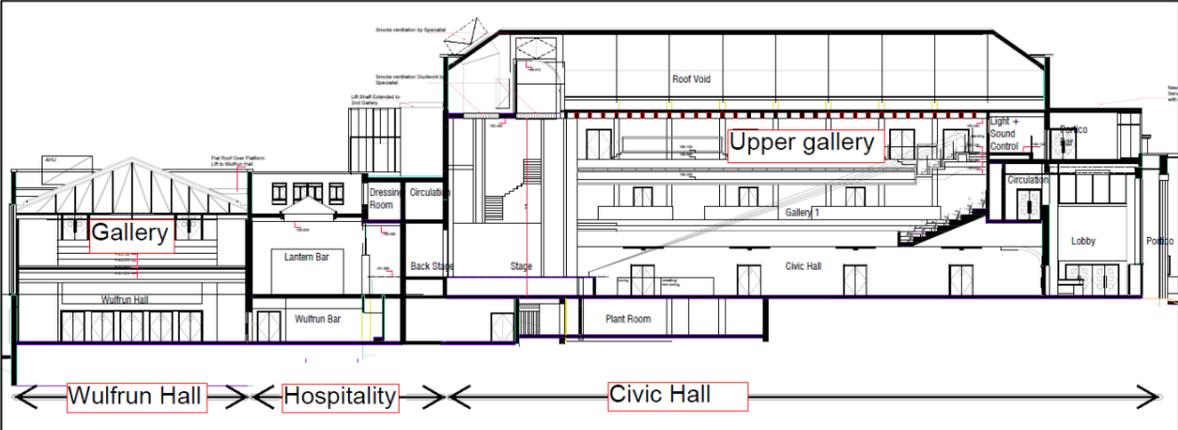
Schematic section of the Halls showing the proposed new tier at Level 3 in the Civic Hall
